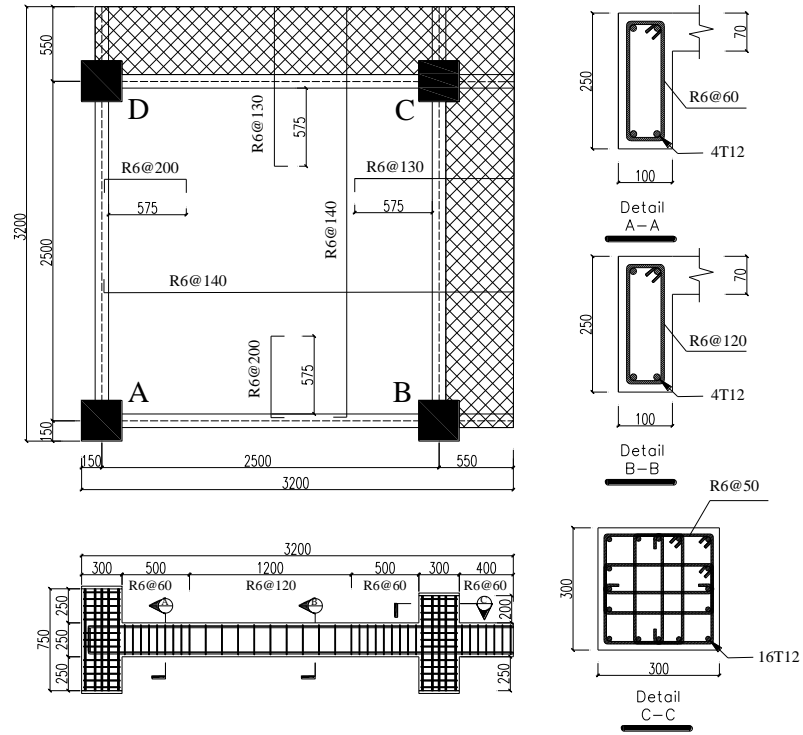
Dimensions of Specimen US (units: mm) [5]
